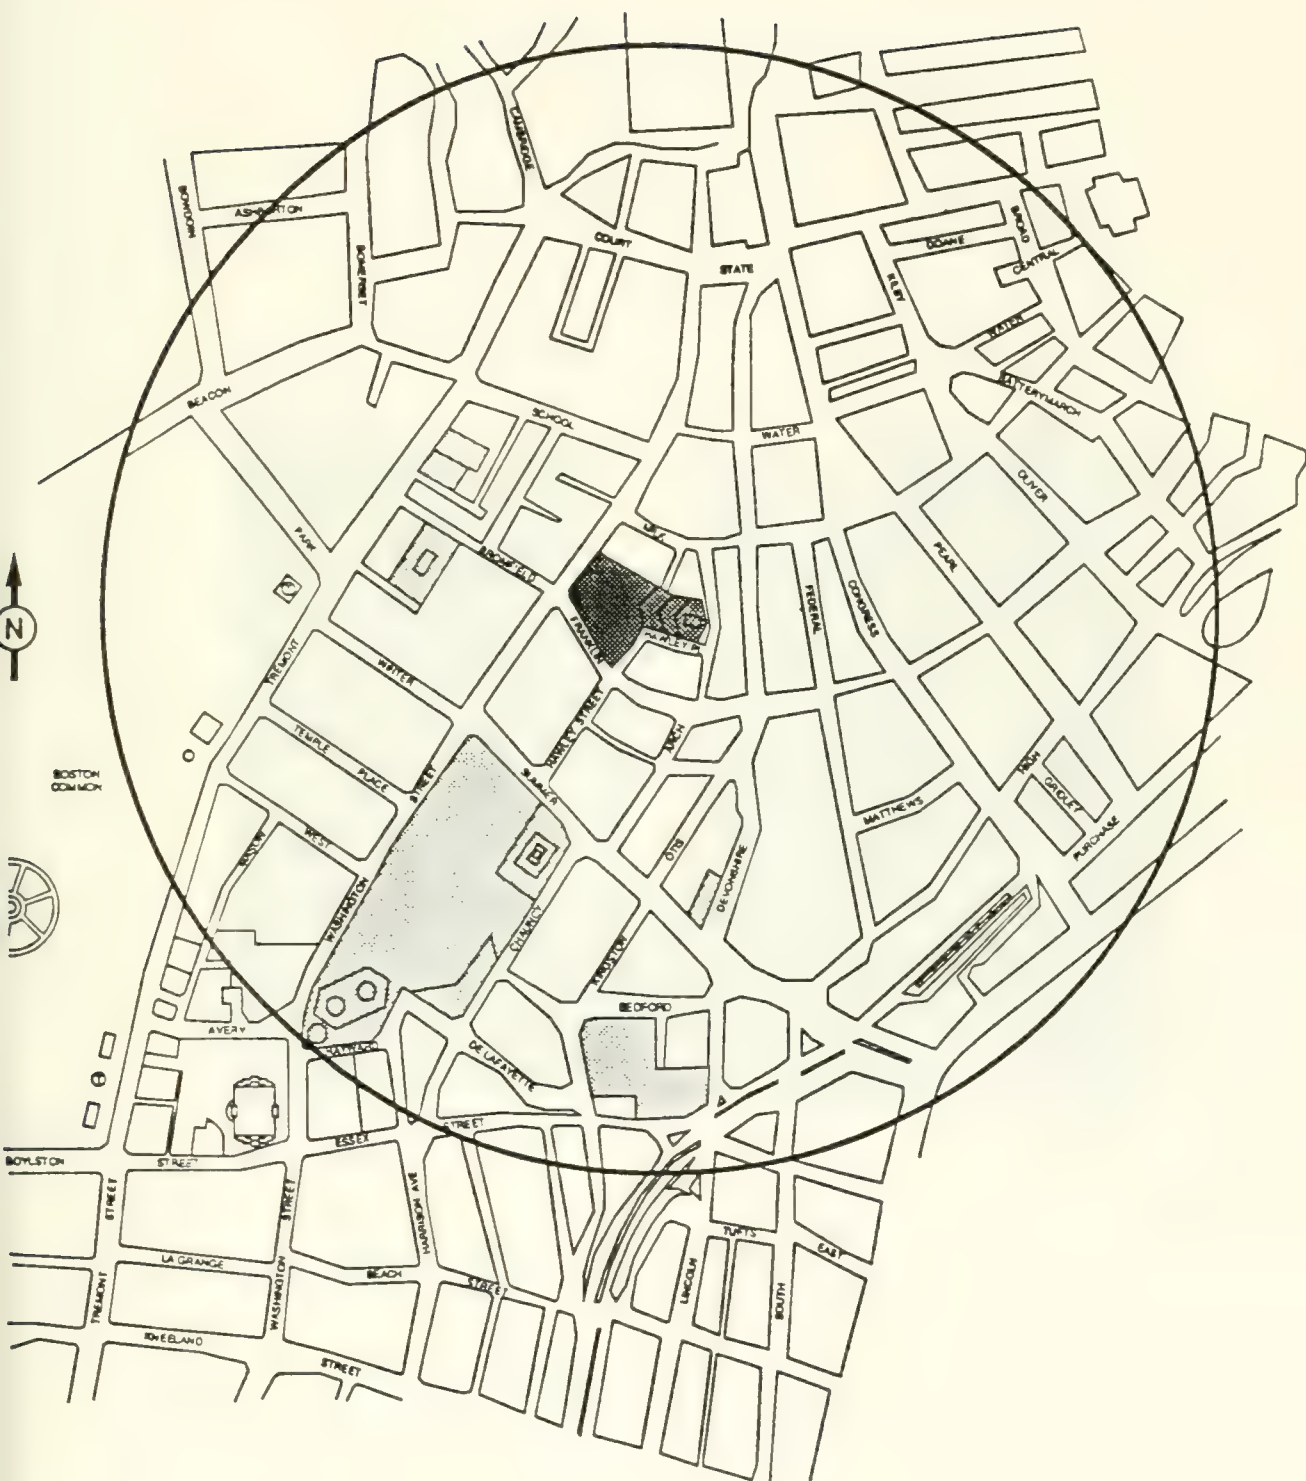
Site plan with area modelled with wind tunnel.
